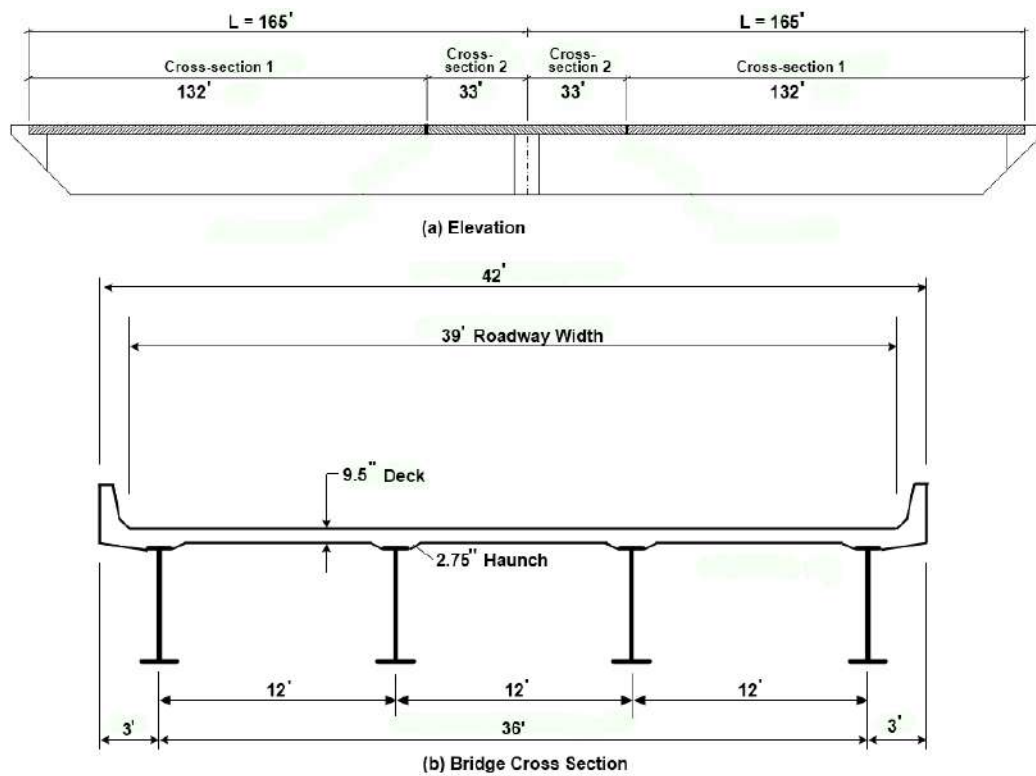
Two-span Continuous Steel Plate Girder Bridge
